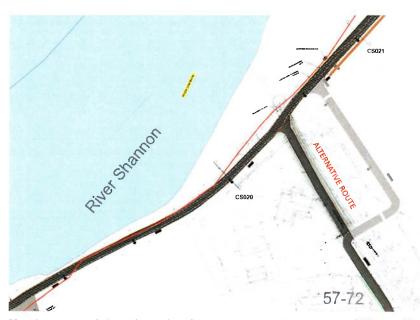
Proposed alternative section of the proposed Greenway to the east of Kilmurray Village, the Horticulture building and University Road
